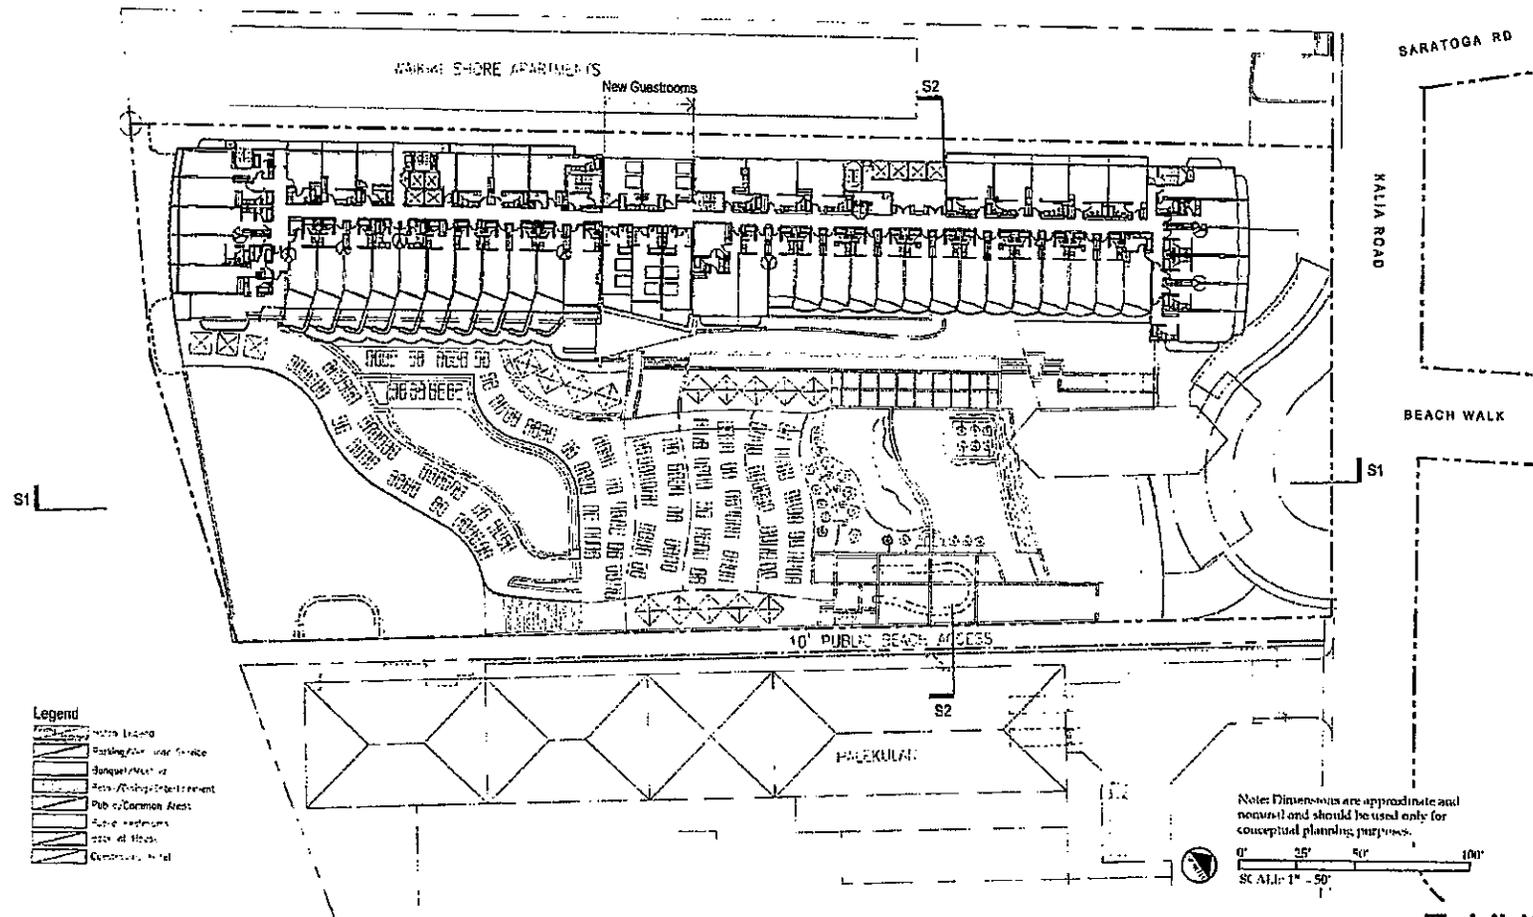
Floor Plan (+23.5 Level - 3rd Floor of Hotel Towers)
